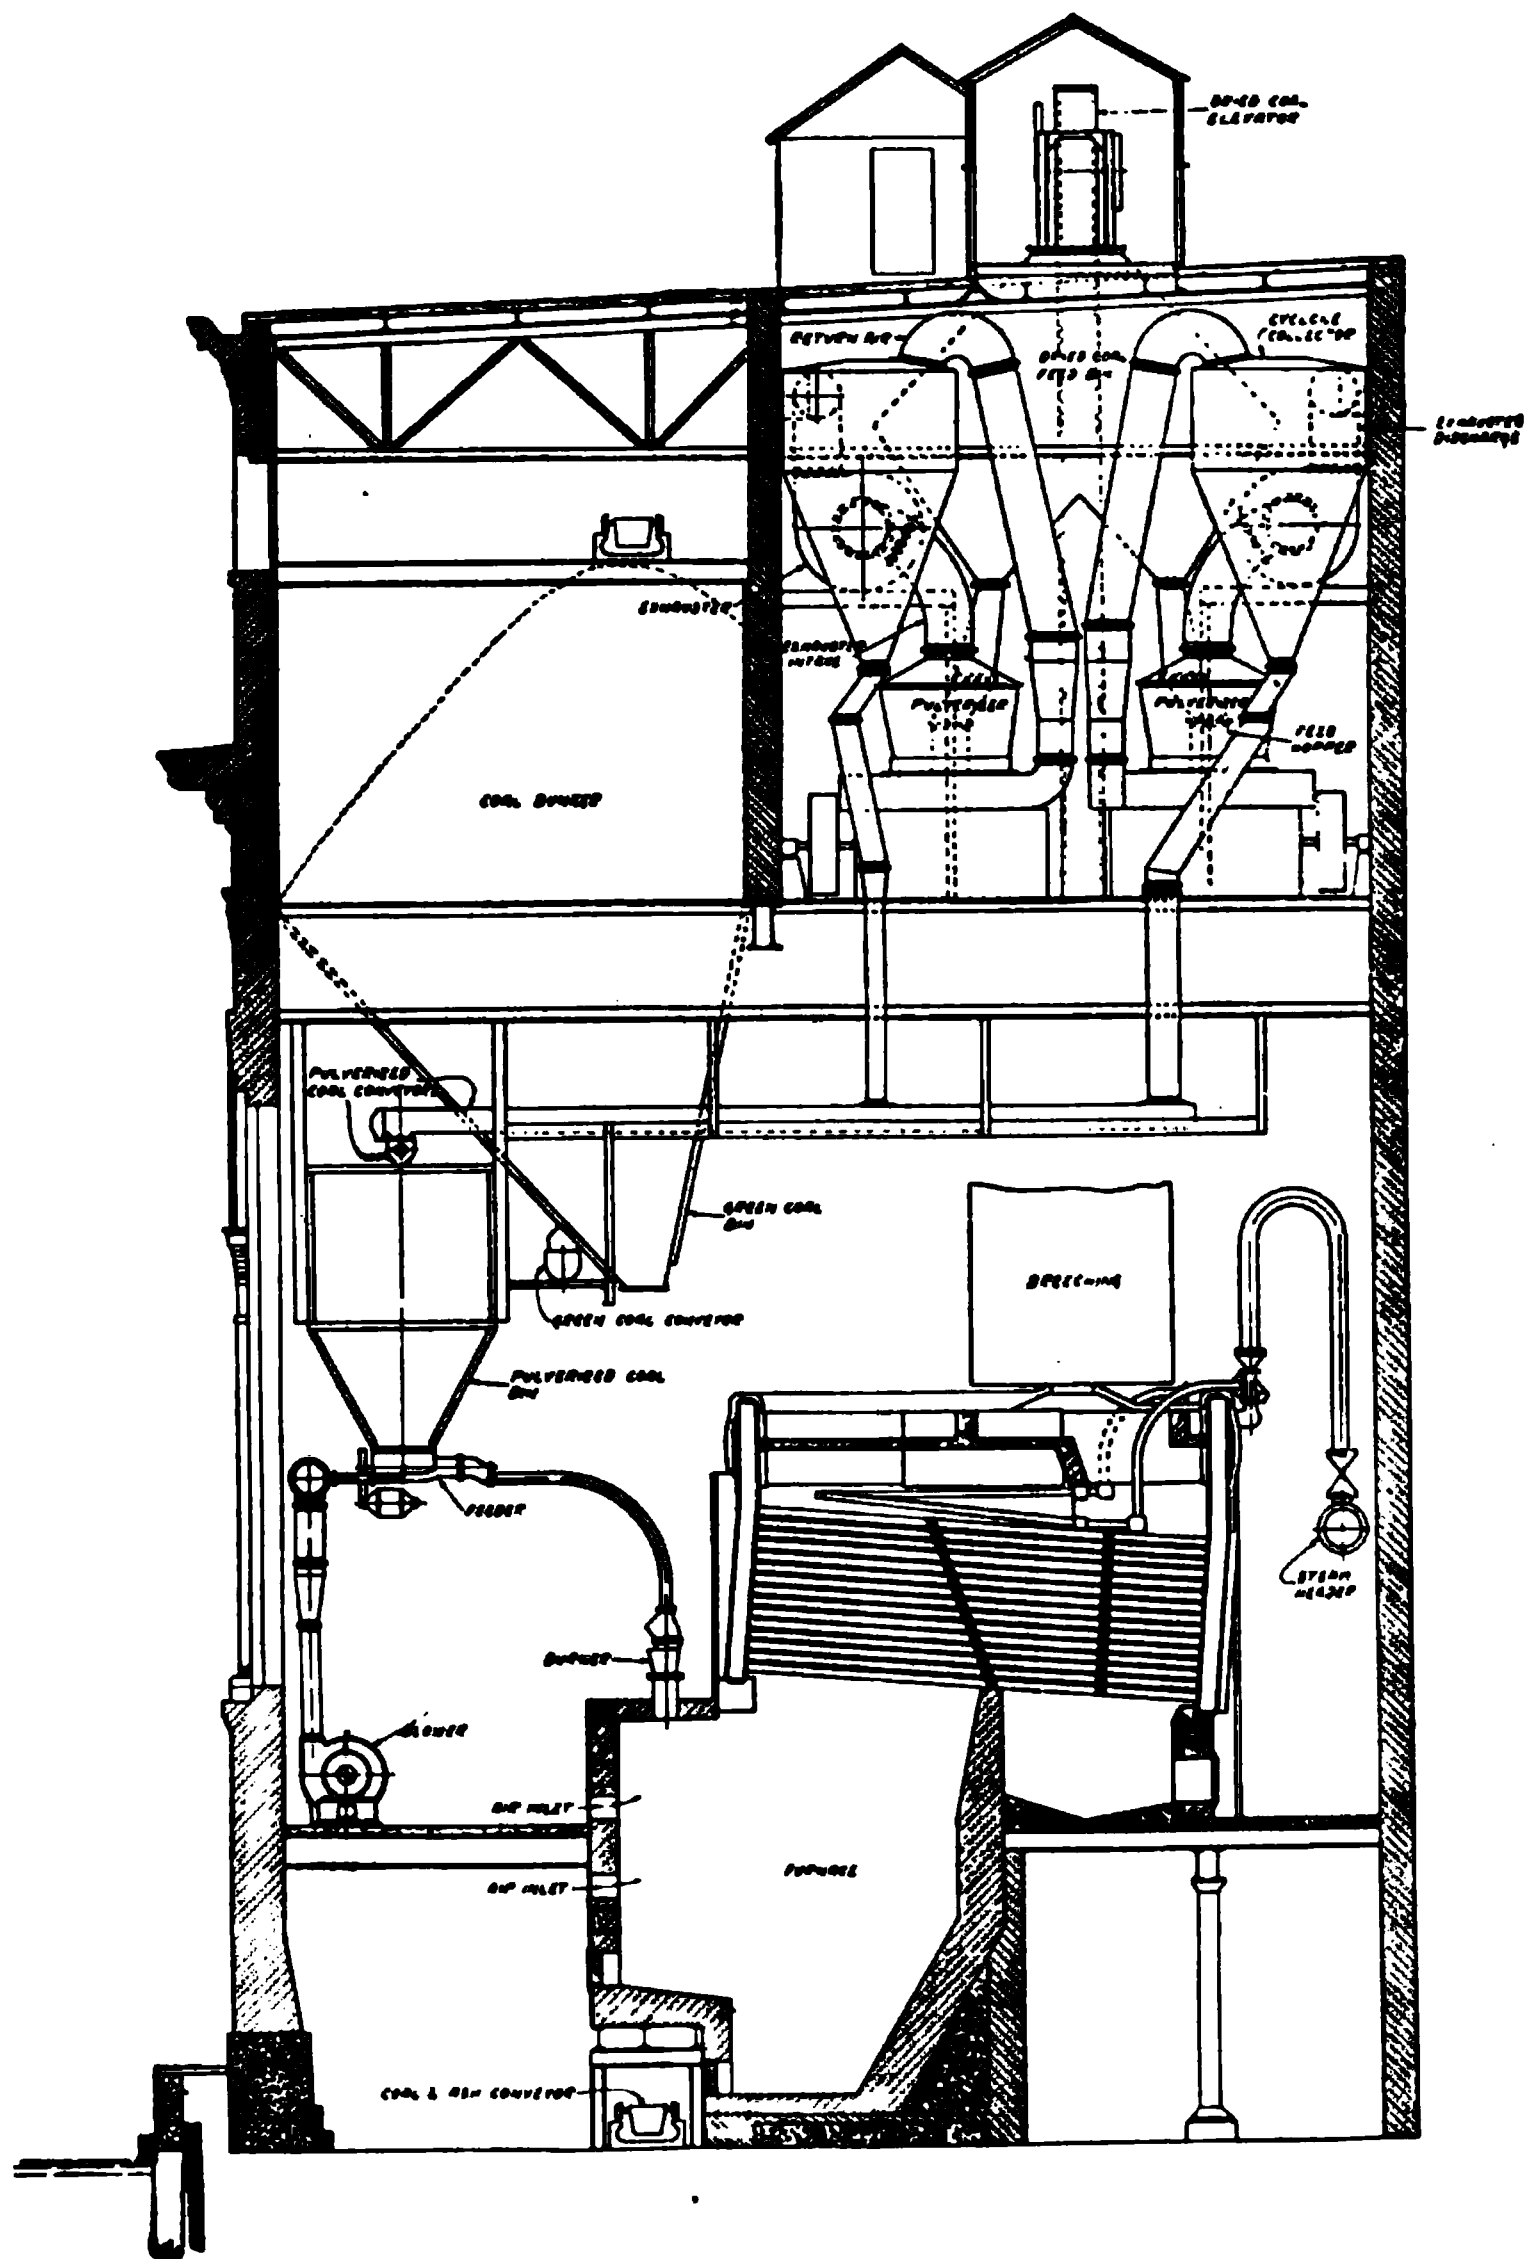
Cross-section through the Oneida Street boiler plant of the Milwaukee Electric Railway & Light Company.
